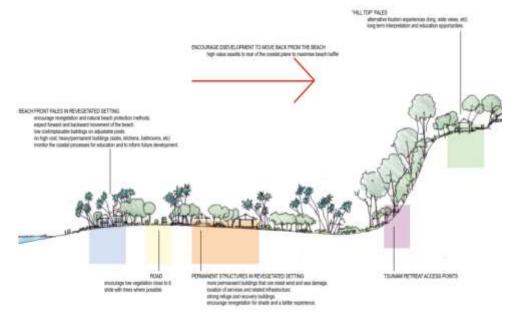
Cross-section of the landscape at Lalomanu – good for infrastructure planning
